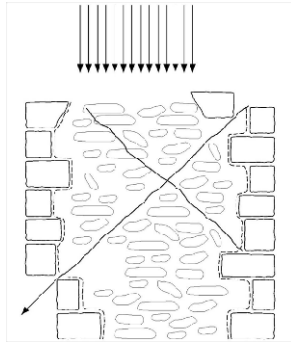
Failure of infill masonry – shear band crack failure (Van Gemert, 1998)
